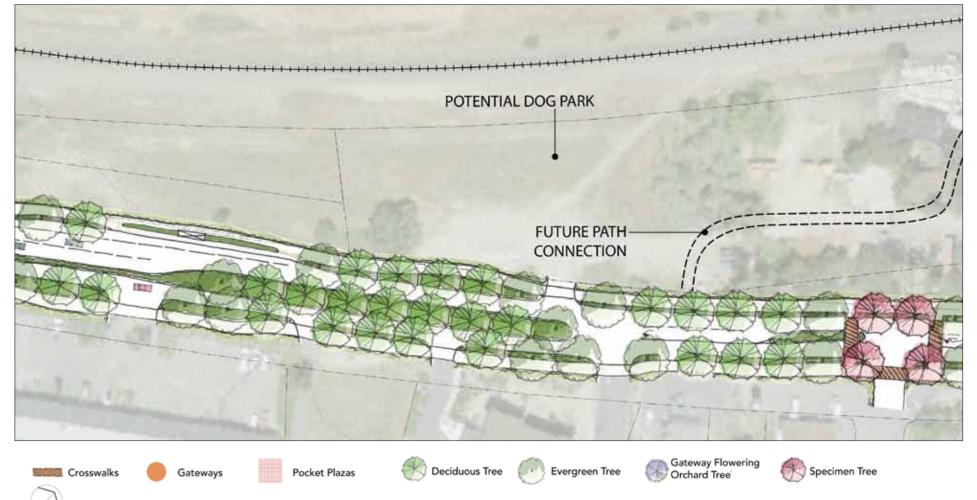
TOWN CENTER WEST CONCEPT PLAN
